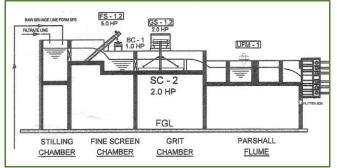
STP 1st Stage --- On Site Drawings and Plans
